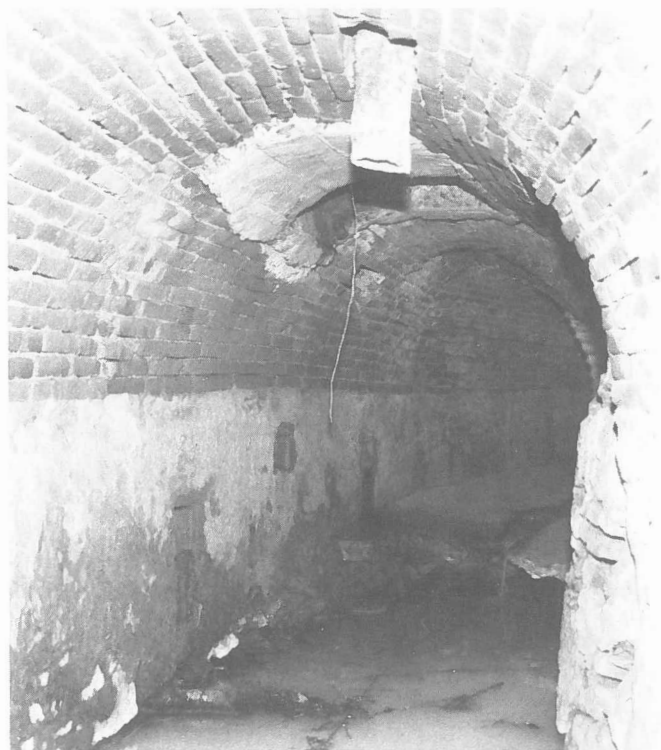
Broken concrete floor slab. This photo shows that the floor slab, whose broken edge is in the background, was poured after the tunnel had been completed. This point has the worst undermining problem in the tunnels: there are ten feet of tunnel with a hole up to four feet deep where the floor should have been.
